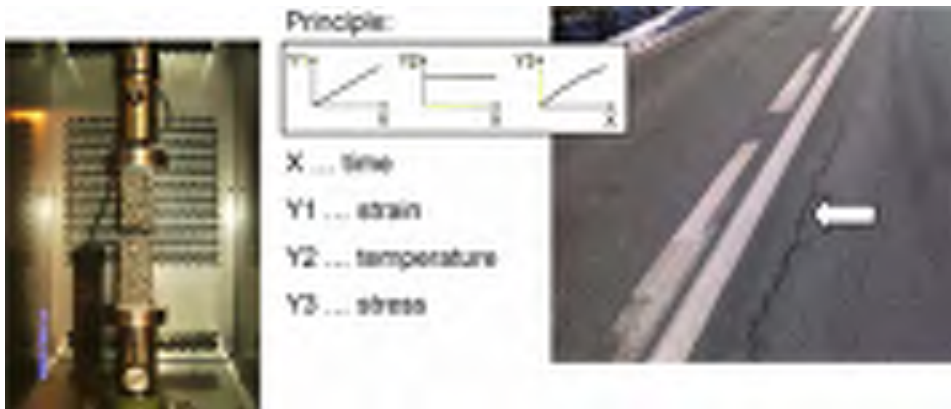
Uniaxial Tensile Strength Test – UTST (left) and longitudinal crack at the wheel tracks (right) [3]
